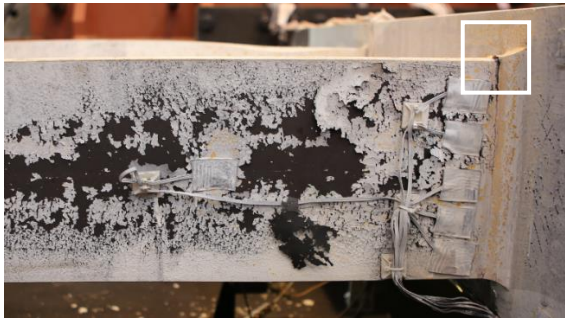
Specimen W4: West Beam Bottom Flange Local Buckling
